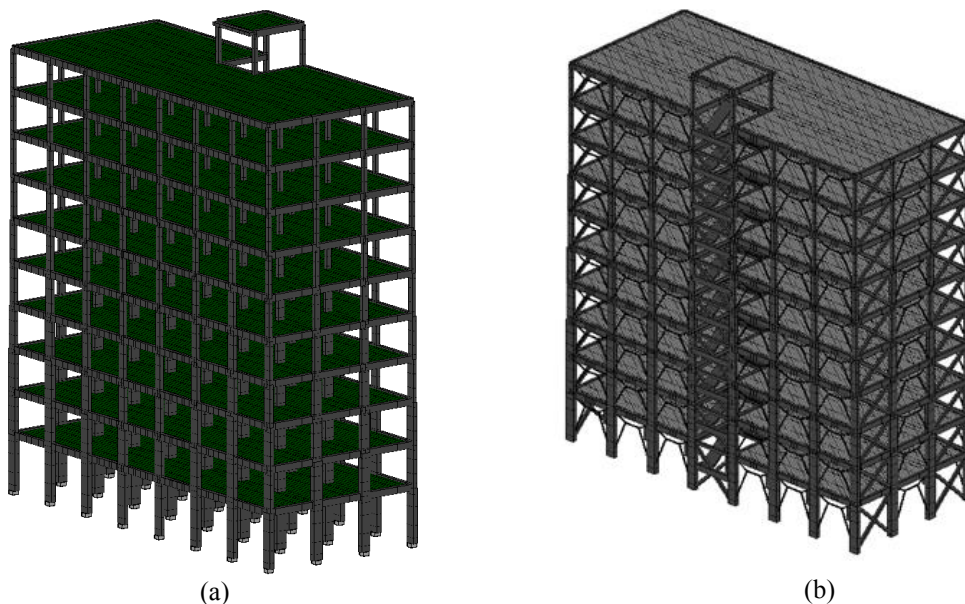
3D models in ADAPTIC for the original building (a) and the strengthened structure (b).
